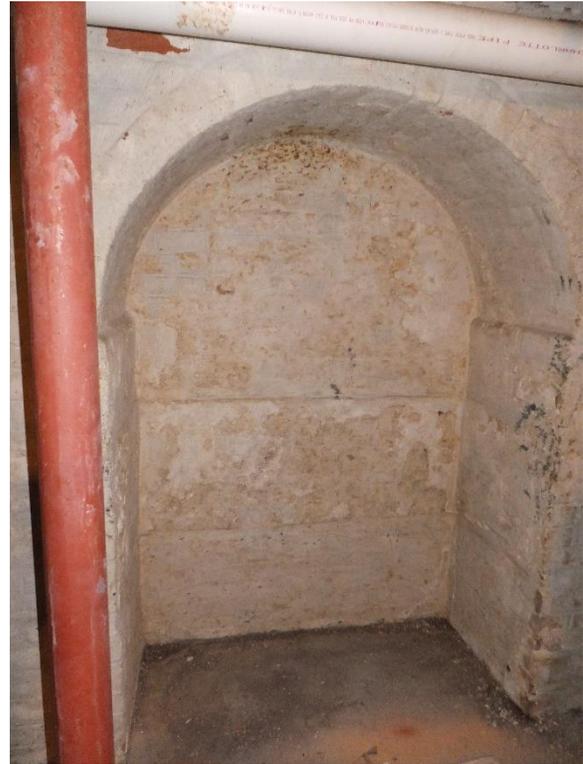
View of the brick masonry arch support for the east fireplace in 2017.
